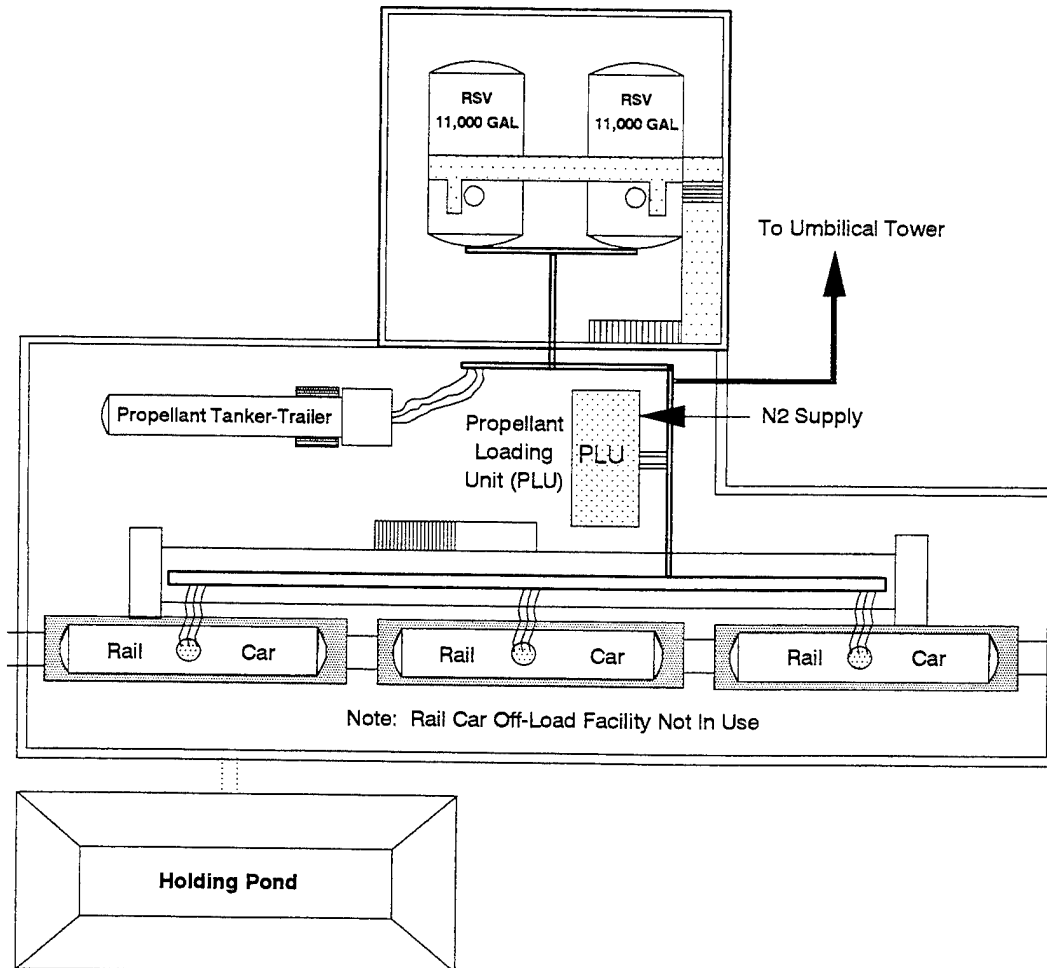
CCAS Titan Fuel Holding Area (FHA) Site Plan.
